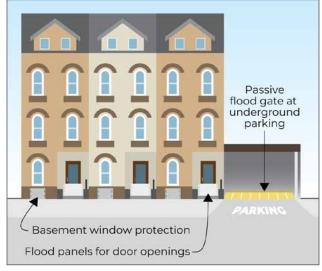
EXAMPLES OF DRY FLOODPROOFING FOR NON-RESIDENTIAL PROPERTIES
